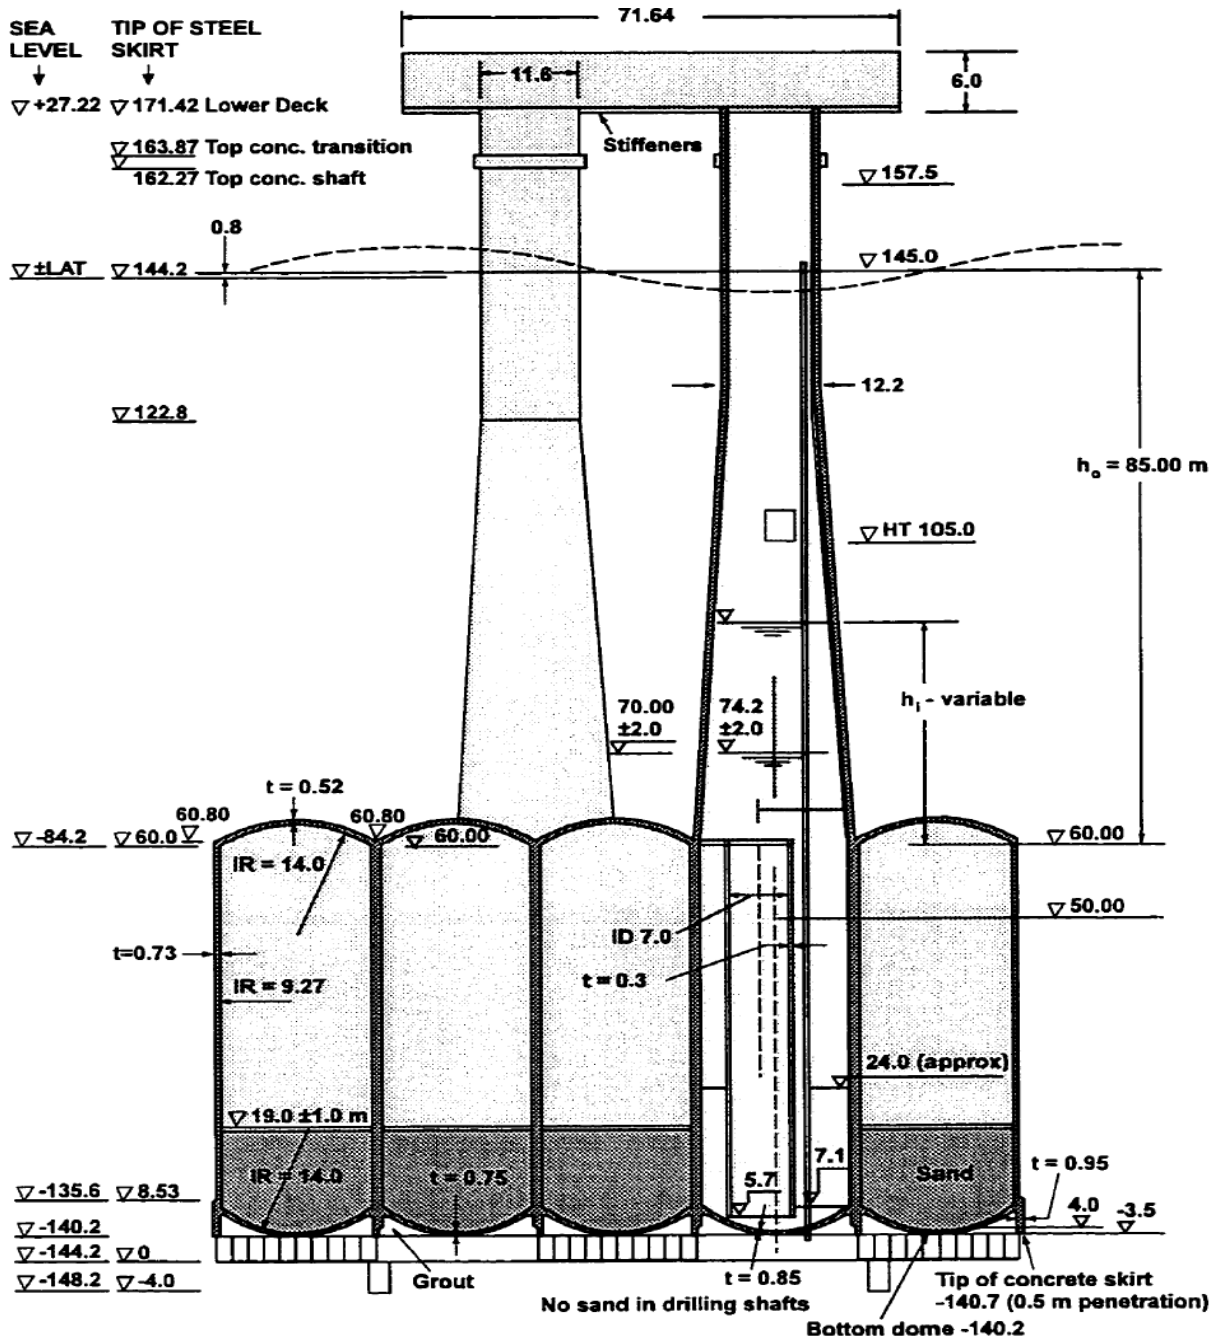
Typical cross section of condeep platforms, used earlier in the North Sea.
